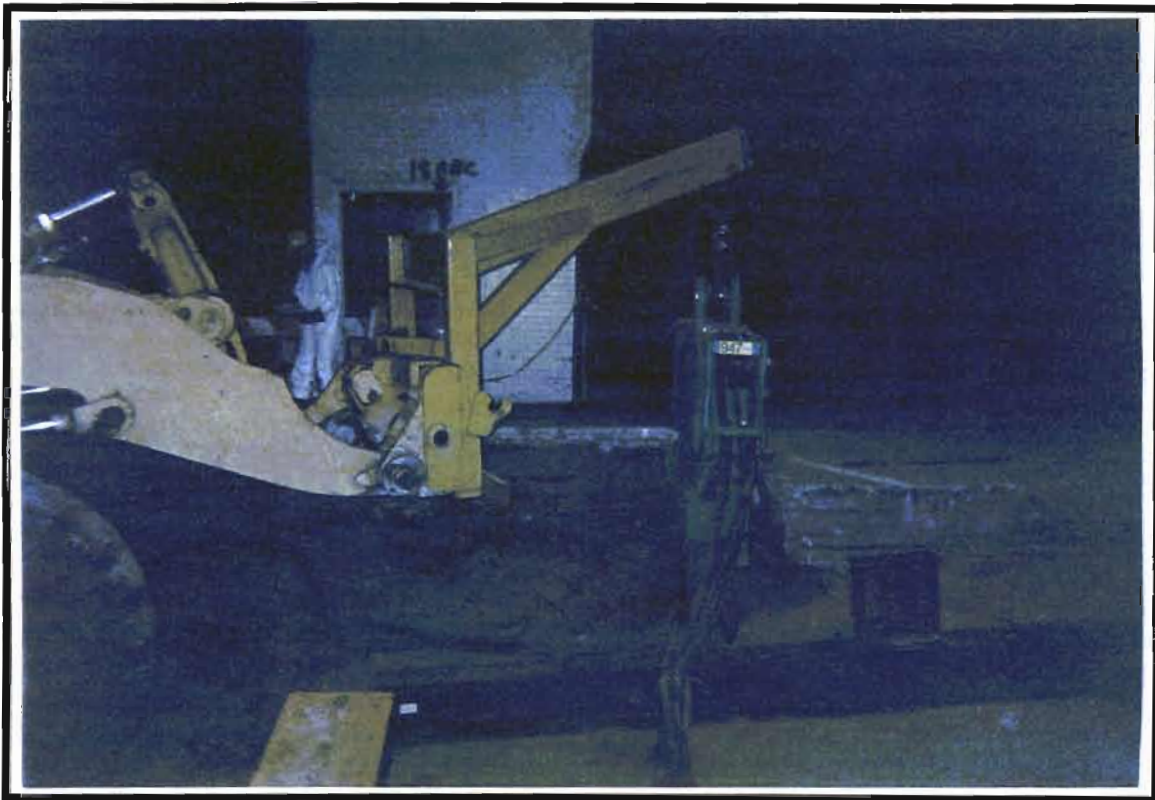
Installation of steel "H" piles with Vibro-Plate pile driving equipment.
